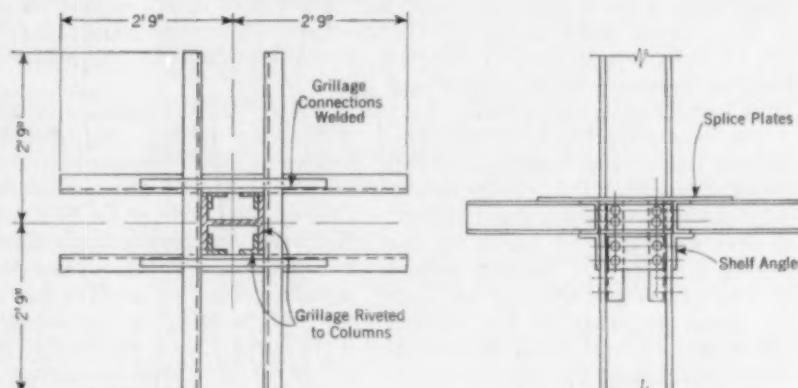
STEEL GRILLAGE FOR CONNECTING REINFORCED CONCRETE AND STEEL COLUMNS
